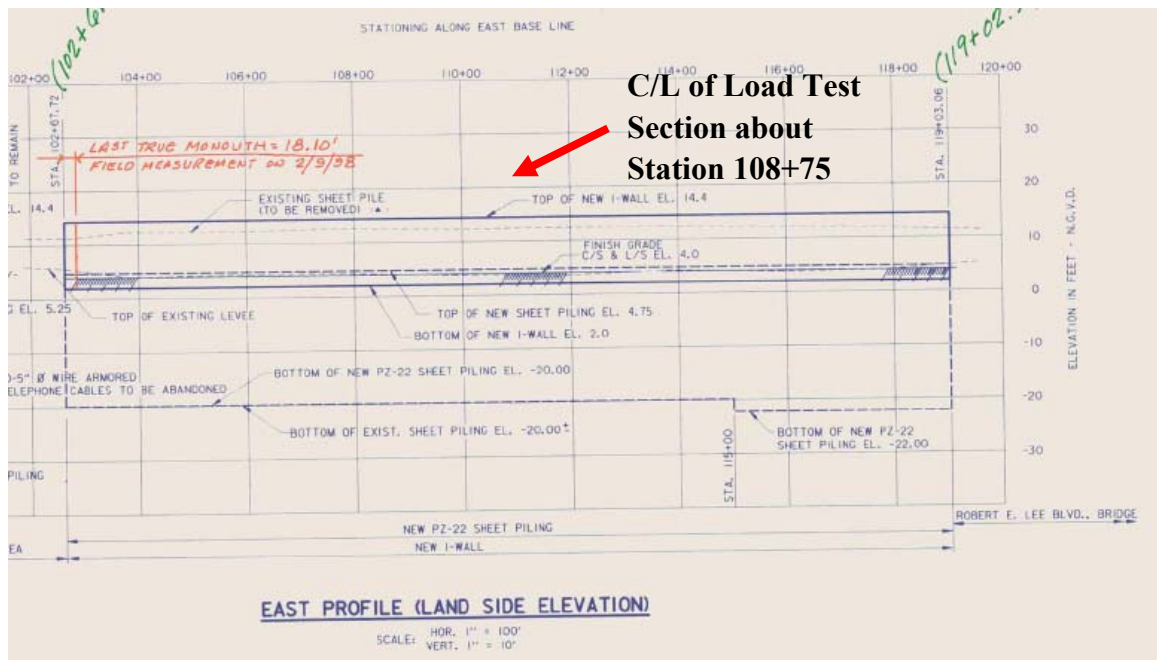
Profile along I-Wall (NGVD Datum)
